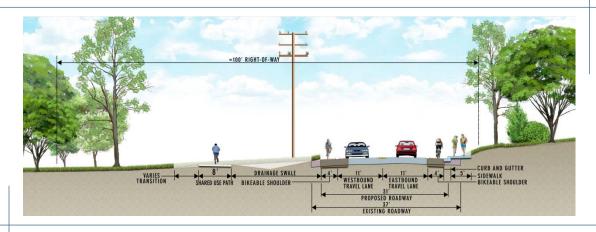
Alternate 3 -Enhanced Master Plan Typical Section Looking East
